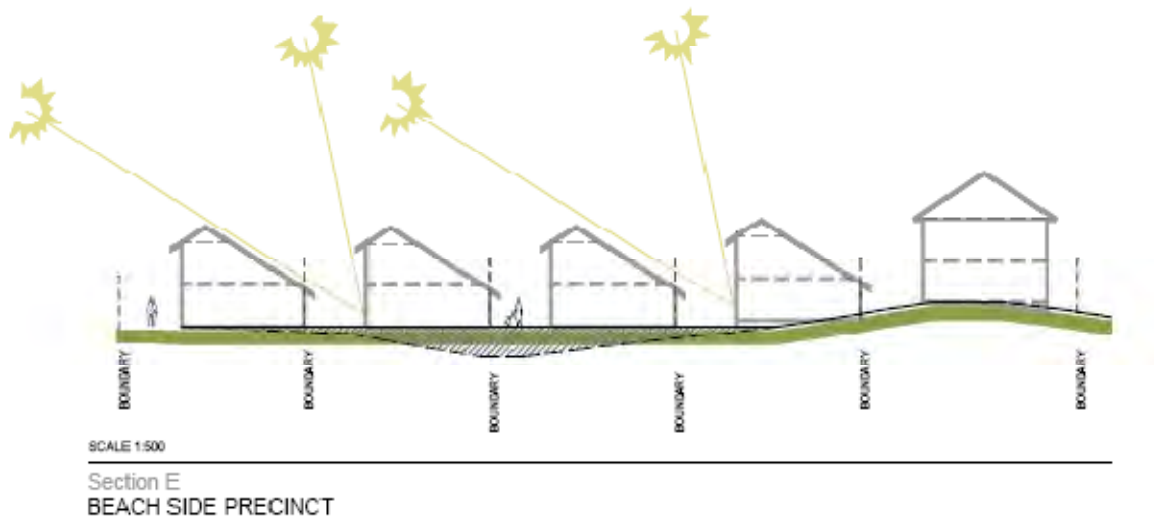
Cross sections of dwellings showing vertical building envelopes ensuring access to northern light. (H+H Architects)
